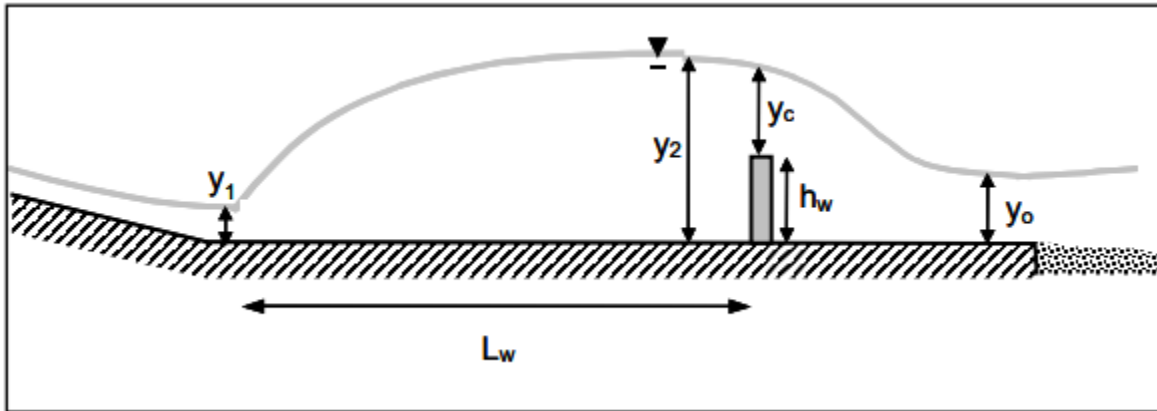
Outlet Weir (FHWA, HEC-14, Figure 7.11)
